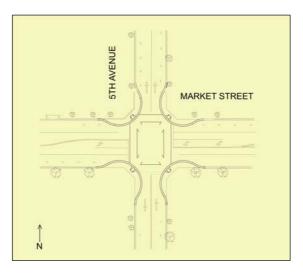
The Proposed Intersection Pop Outs of 5th Avenue and Market Street
